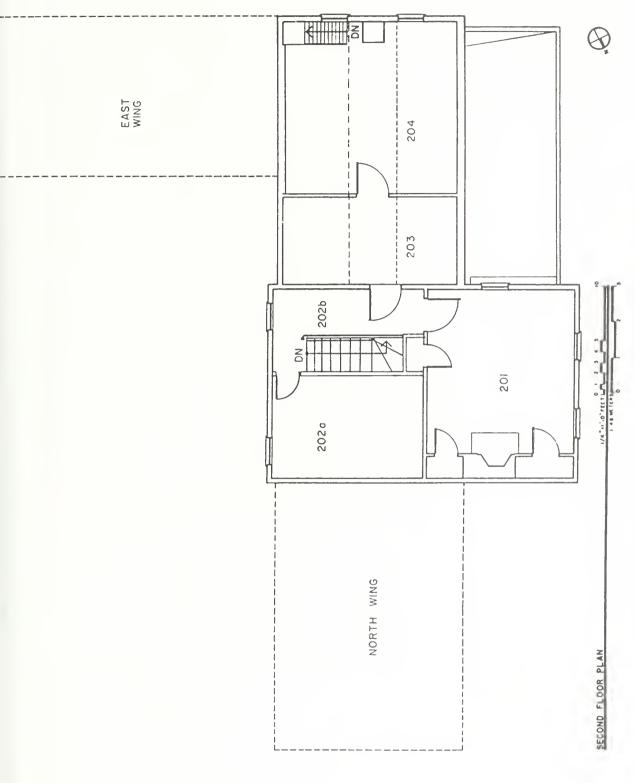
Conjectural second-floor plan of William Bayard's house, circa 1837.
